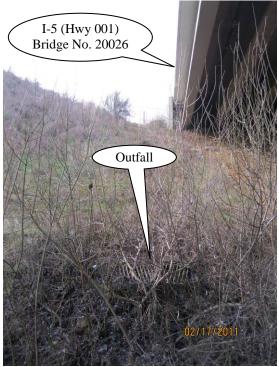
Outfall to ditch. This outfall discharges stormwater from D00038 as well as D00039 and D00034. The picture was taken facing south.
